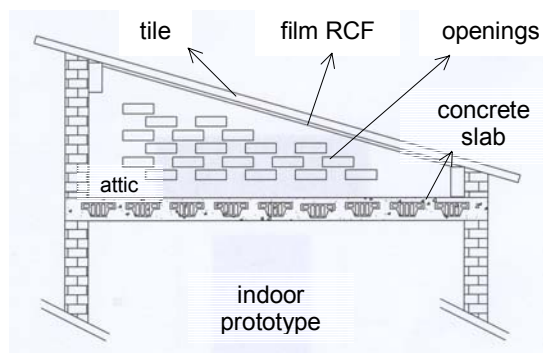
Diagram of the natural ventilated attic and roof construction of prototype
